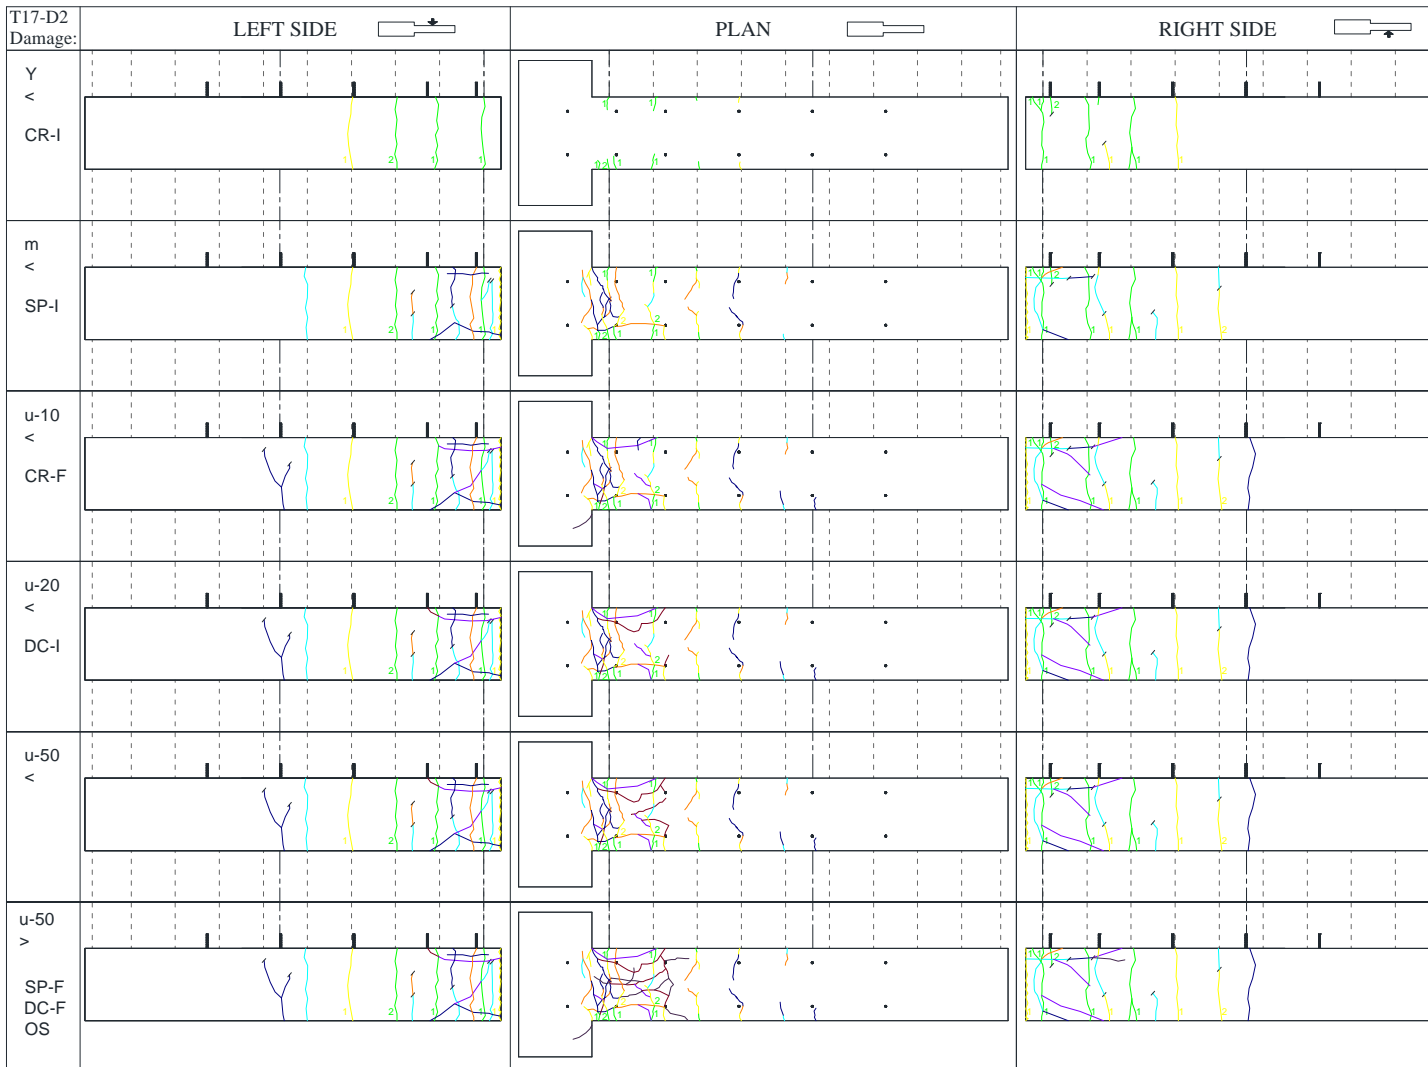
Damage development on column specimen T17-D2 at different damage levels.
